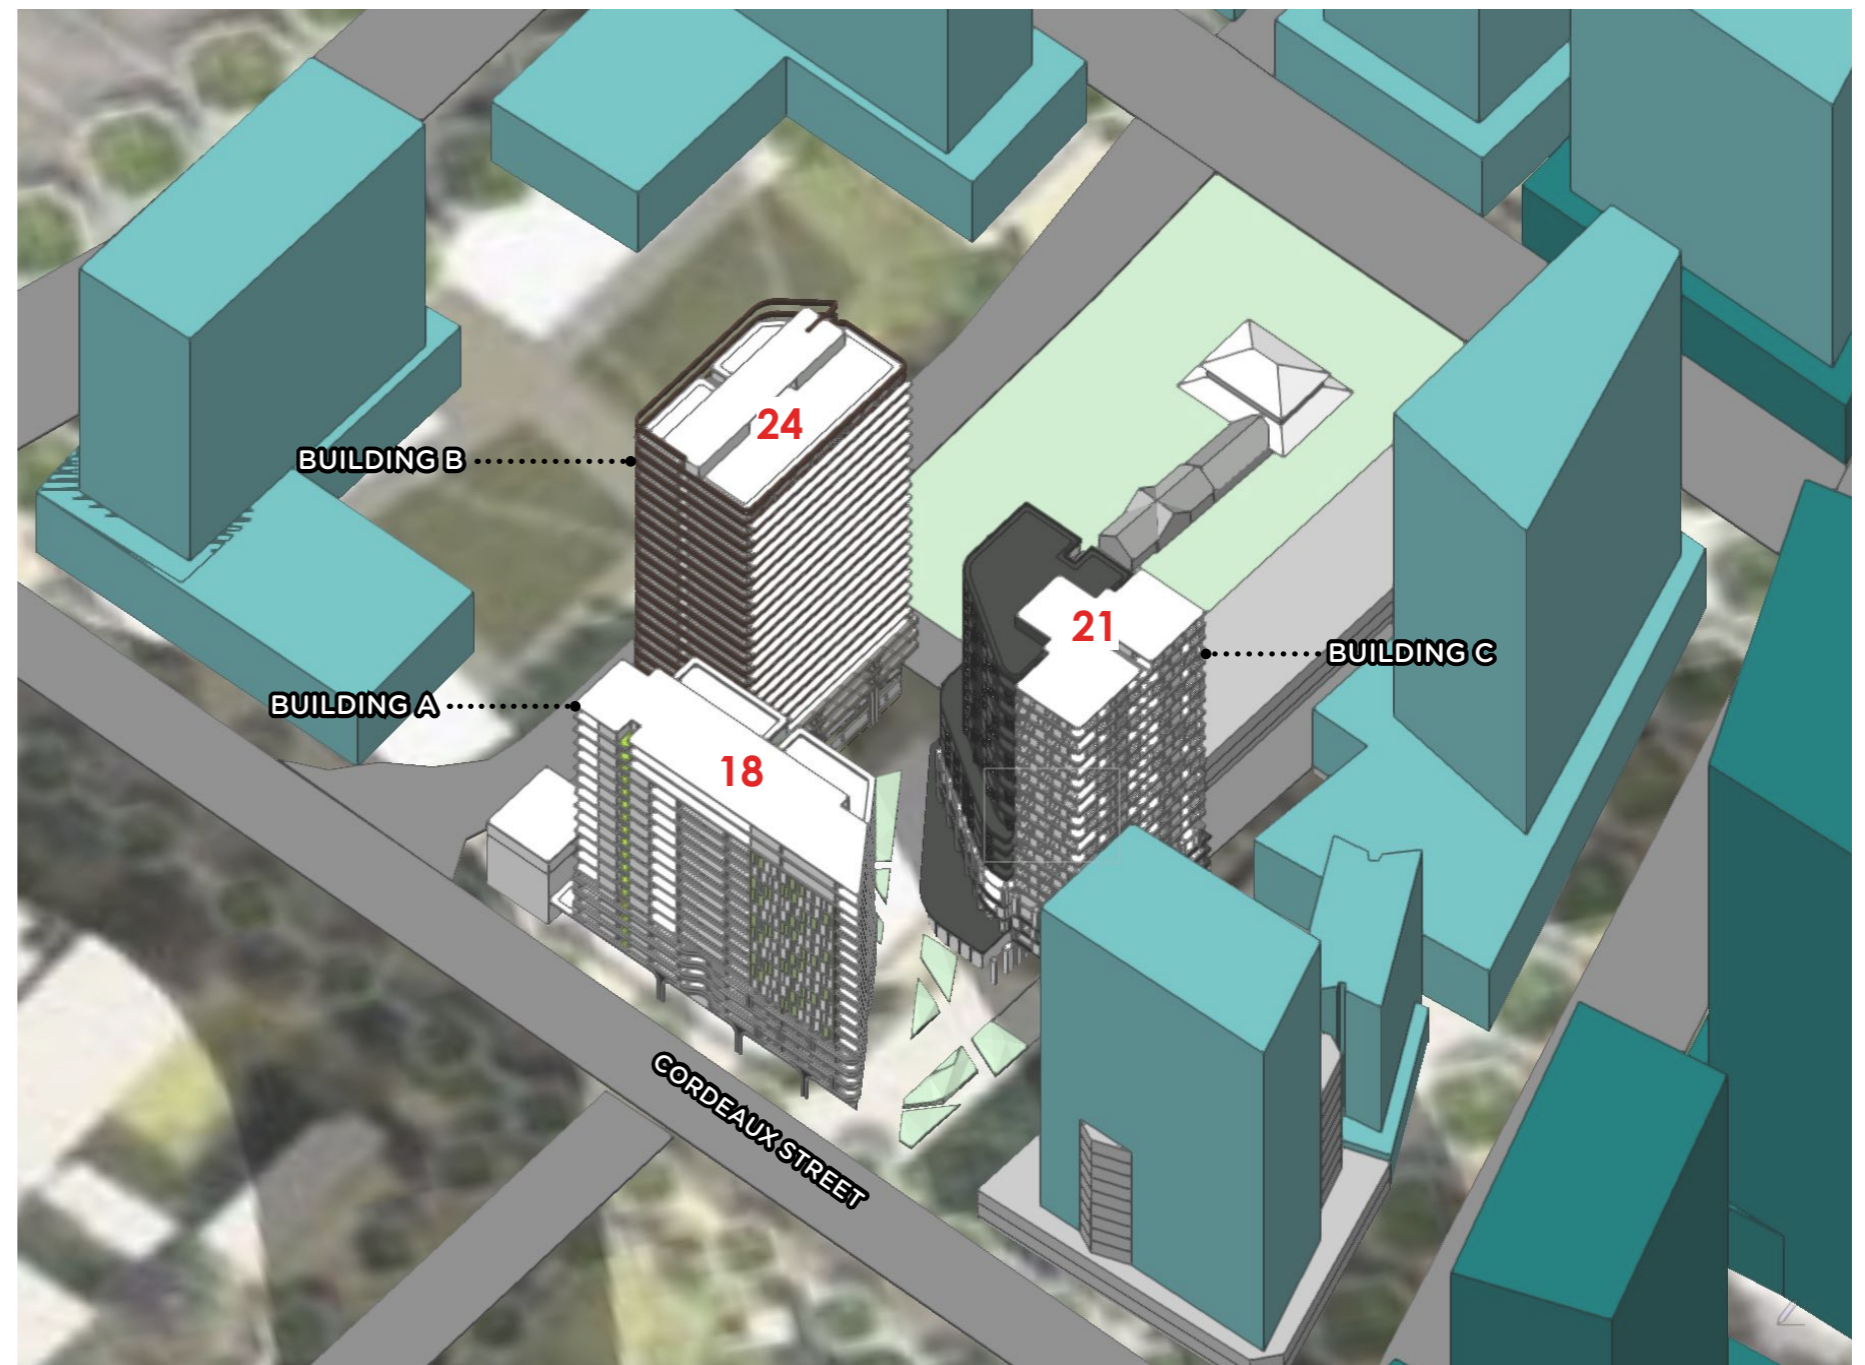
Current Proposal - Building Massing (Source: Aleksandar Design Group)
